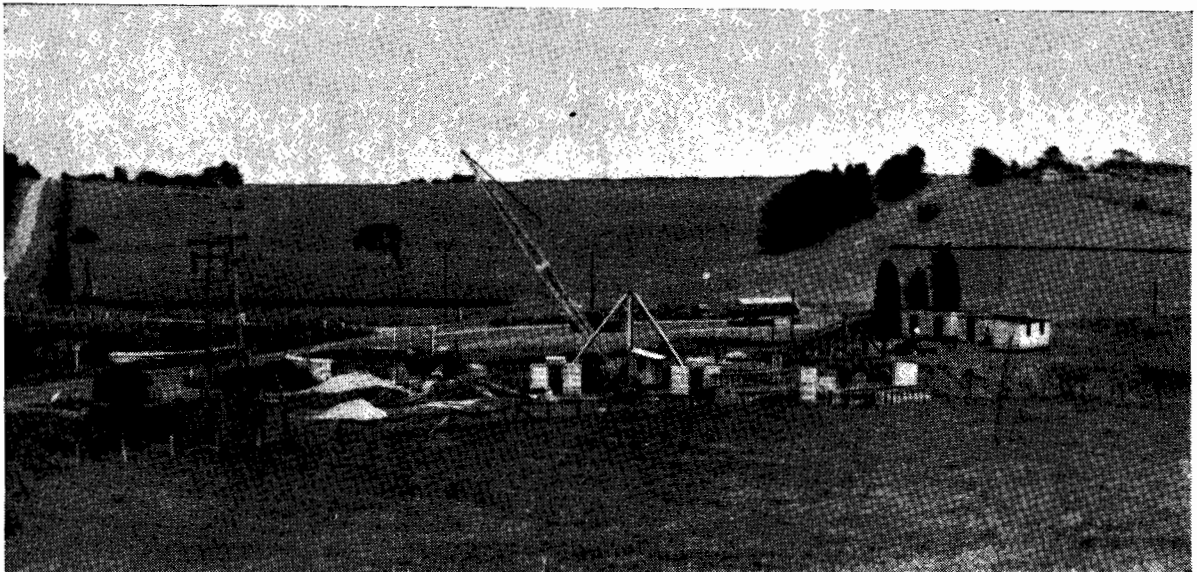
New bridge under construction on Princes Highway West at Waurm Ponds.
